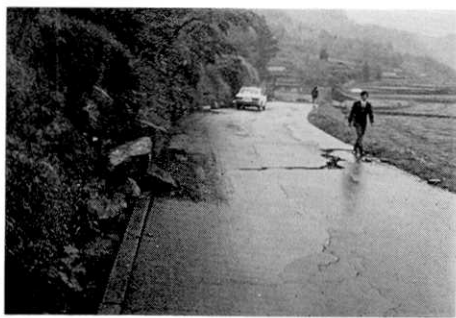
Cracks on an asphalt-road at Kozuru.
